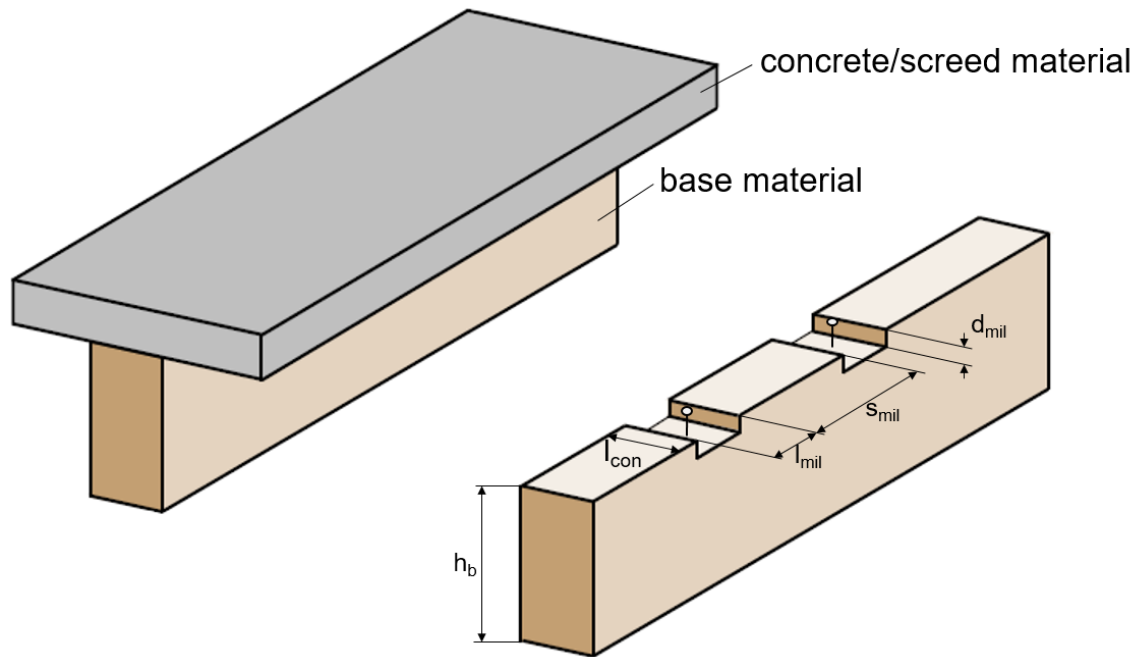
Example type 5 of wood-concrete composite slab kit
